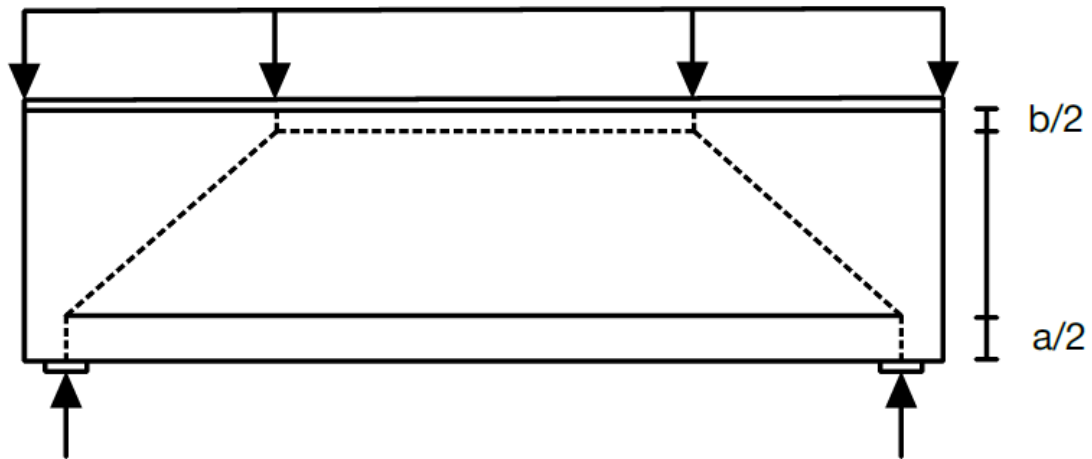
Strut and Tie model for Model 2.2 without prestressed reinforcement
